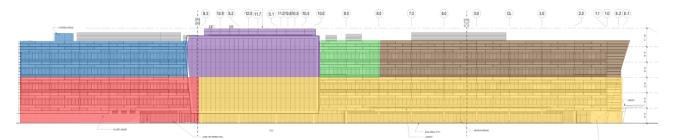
STRUCTURAL STEEL ERECTION SOUTH ELEVATION
